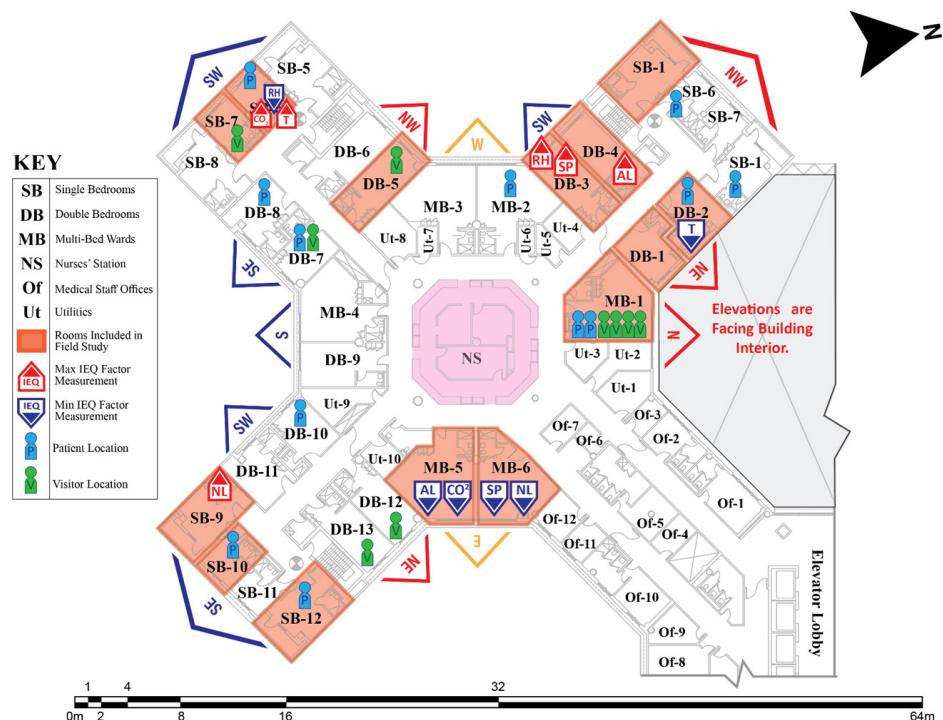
Typical non-intensive ward floor layout with added key information (Author, 2024).
